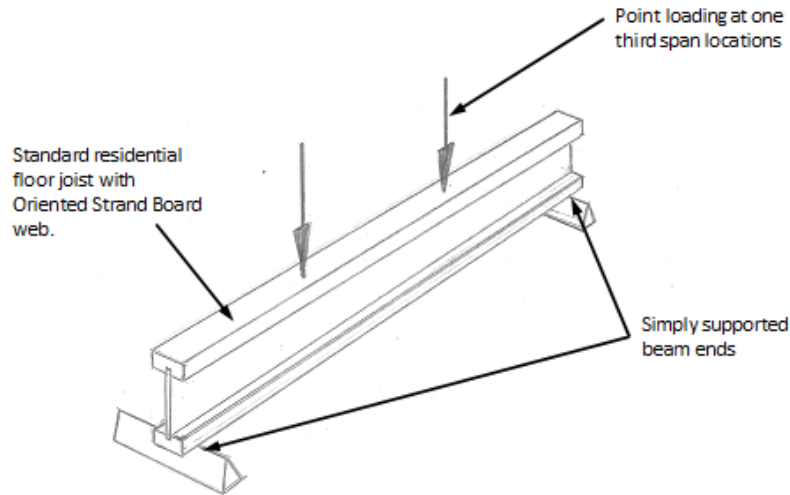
SCHEMATIC DIAGRAM OF ENGINEERED TIMBER JOISTS
